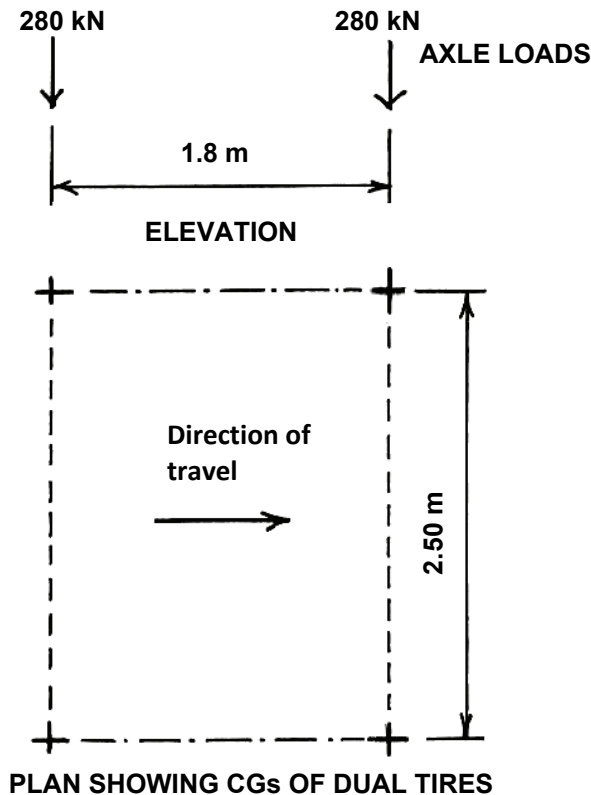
Proposed Heavy Off-highway Design loading for timber decks
